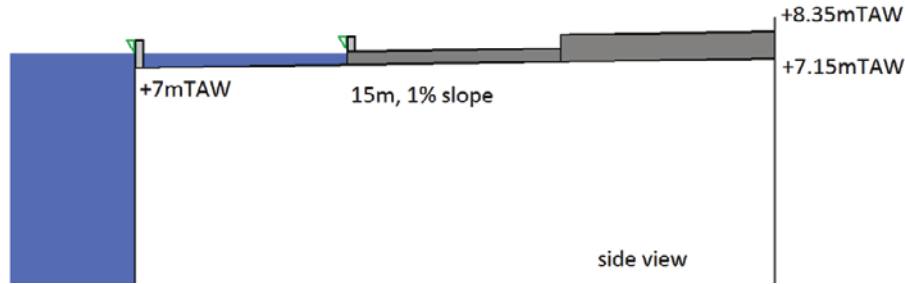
Reducing wave overtopping by changing the open row of walls by parapets, side view.
